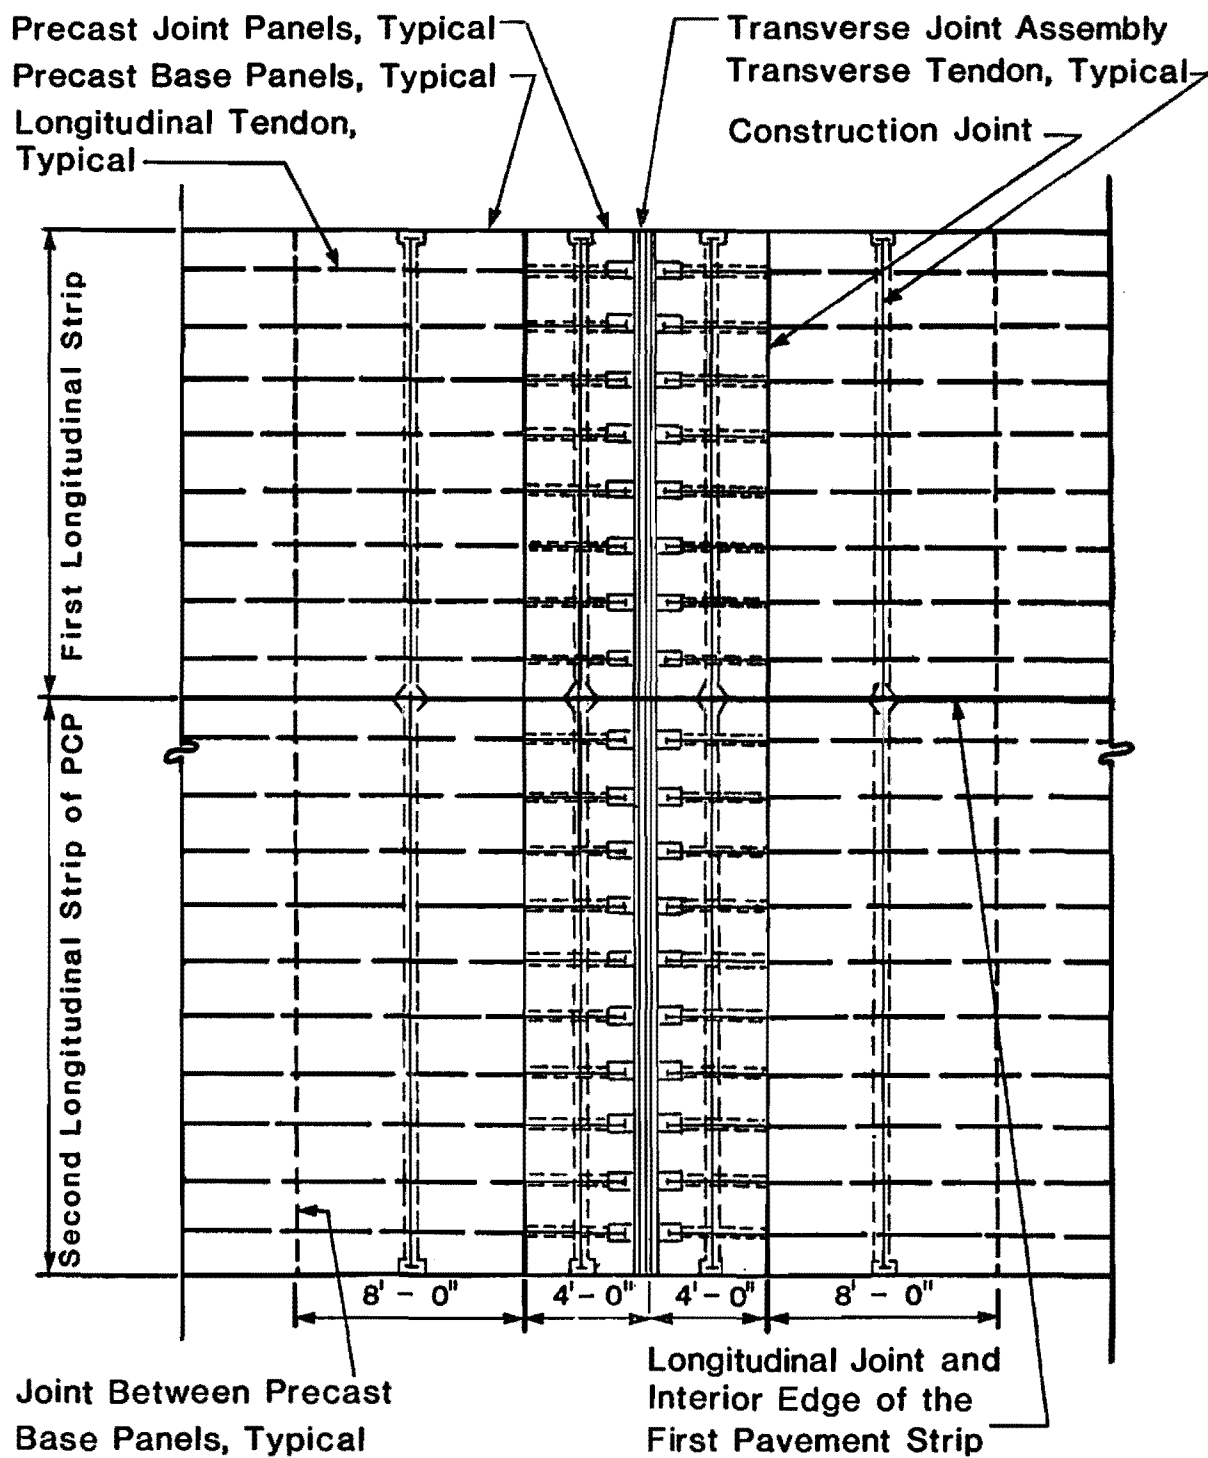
Composite prestressed concrete pavement type I (CRCPI).
